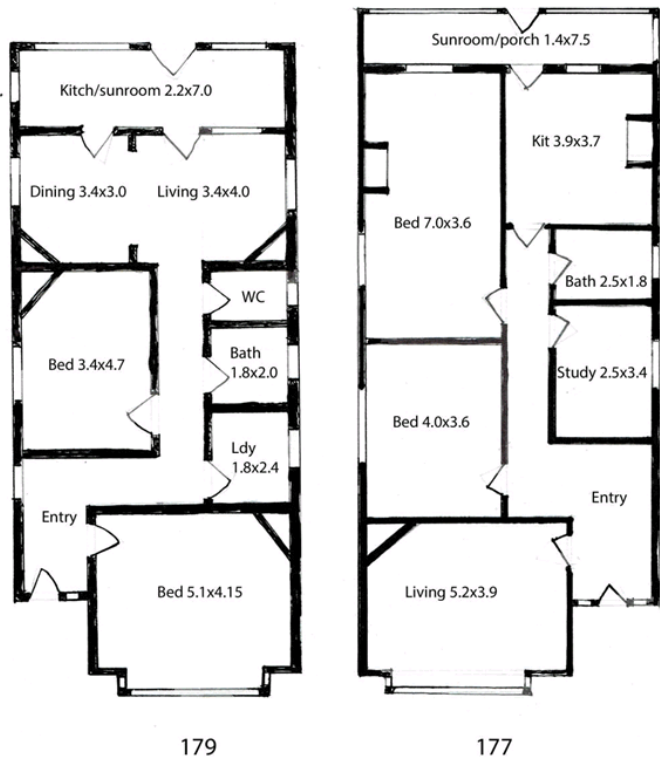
Floor plans of 177-179 Campbell Street (street to bottom of plan, note doors and windows not necessarily to scale.
